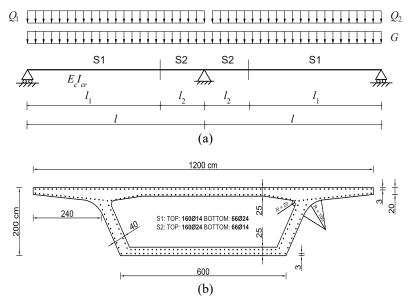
RC box girder bridge: (a) structural scheme and loadings; (b) geometry and reinforcement layout of the deck cross-section (dimensions in cm).
